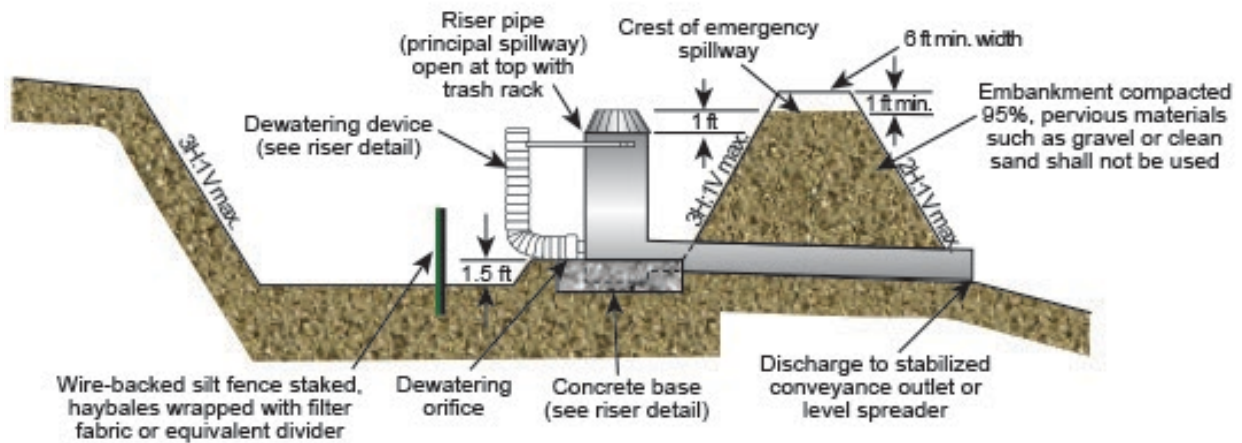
Sediment basin plan cross section (Washington State Department of Ecology 2012).
